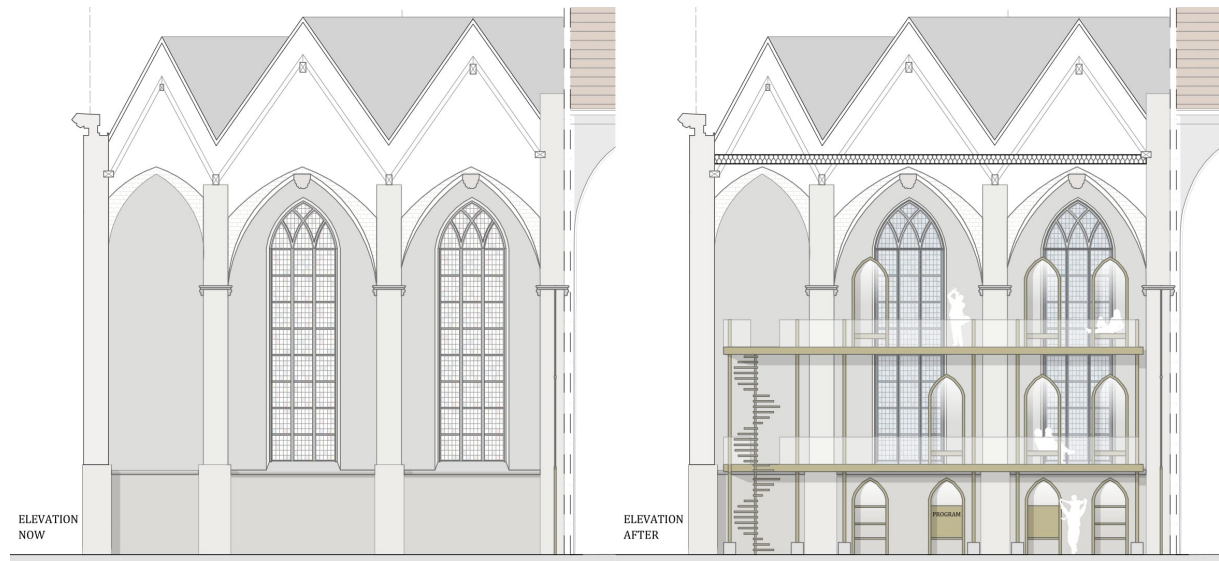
Elevation internal North facade North chapel Stevenskerk before and after
